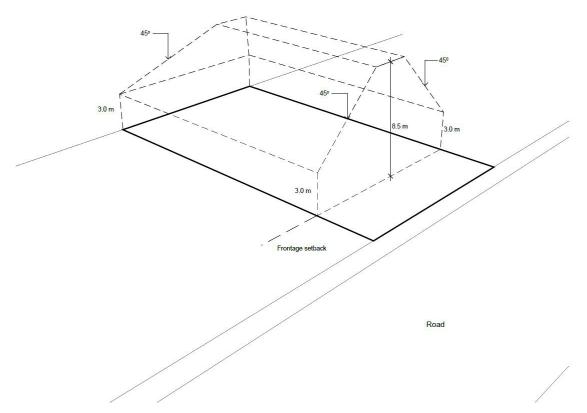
Building envelope as required by clause 10.4.2 A3(a)
